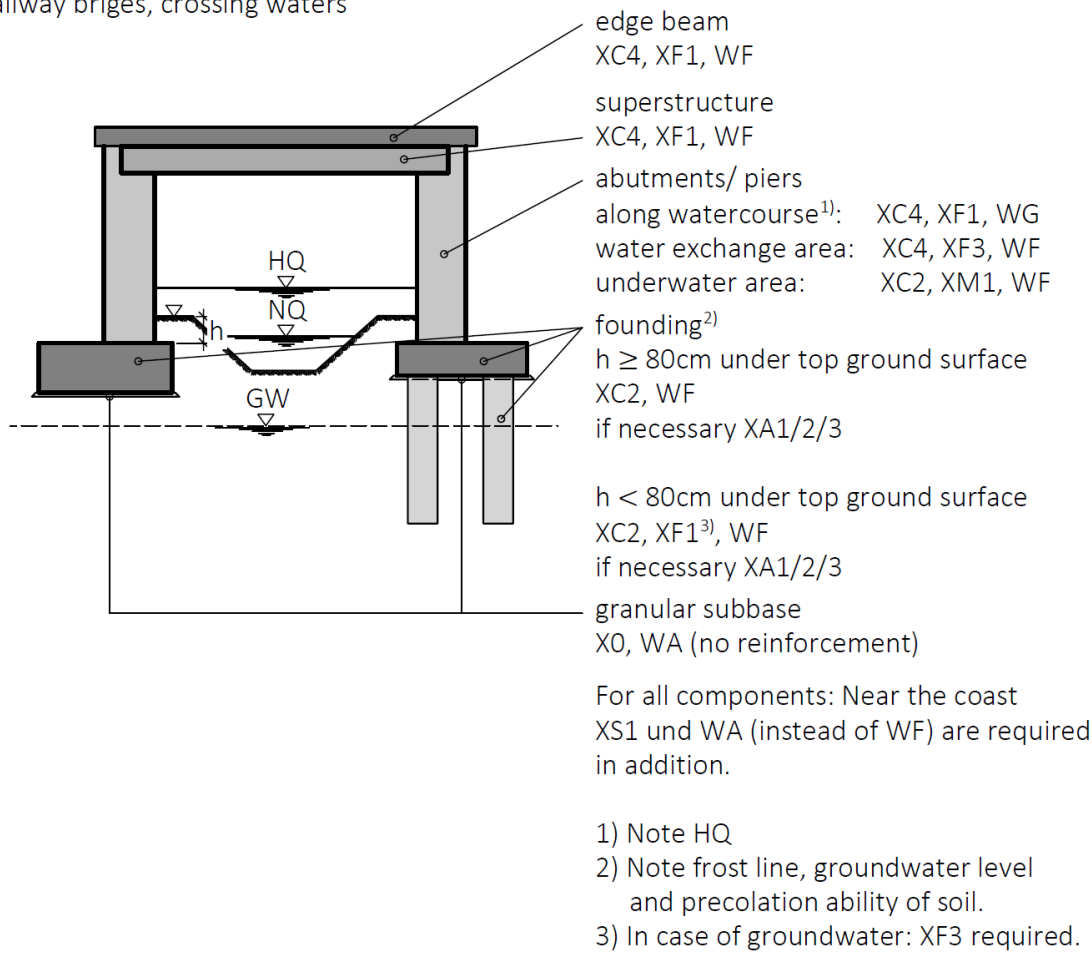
exposure classes for railway bridges, crossing waters according [U9]
